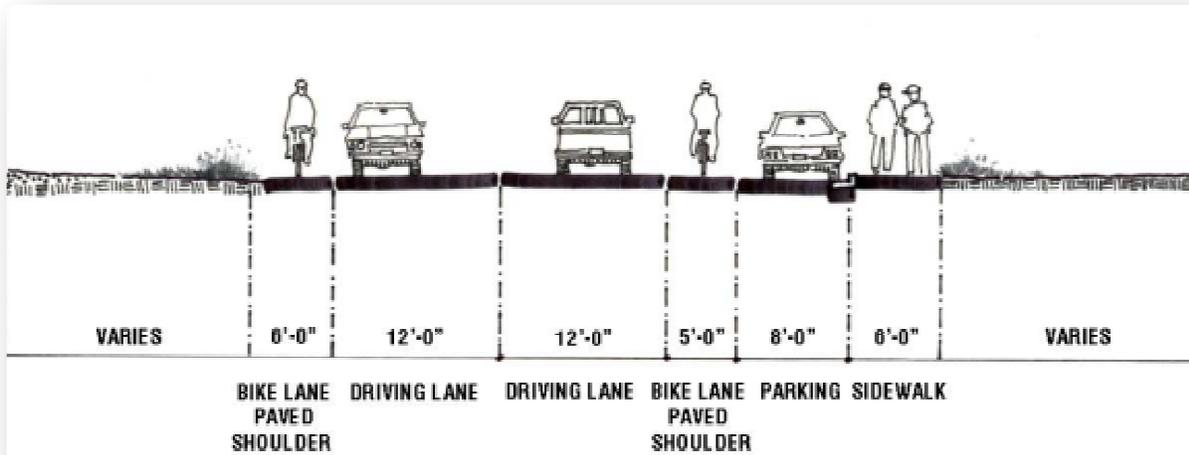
Proposed Section Washakie Avenue looking west from Lower Hanover Canal
